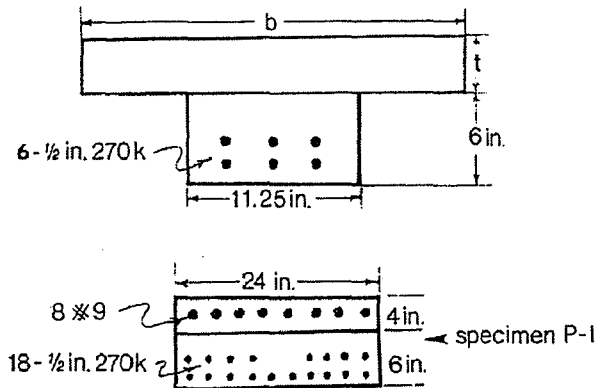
Cross-Section of Beams Tested by CTA-76-B4
